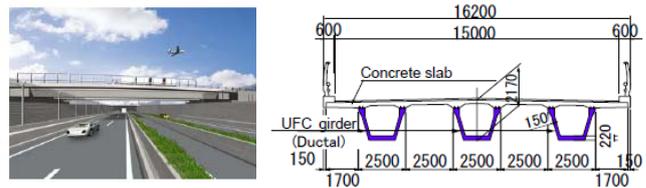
Slender and straight profile of beam by UHPC, Haneda airport ground service equipment bridge, Rendering, (MLIT and Taisei)
